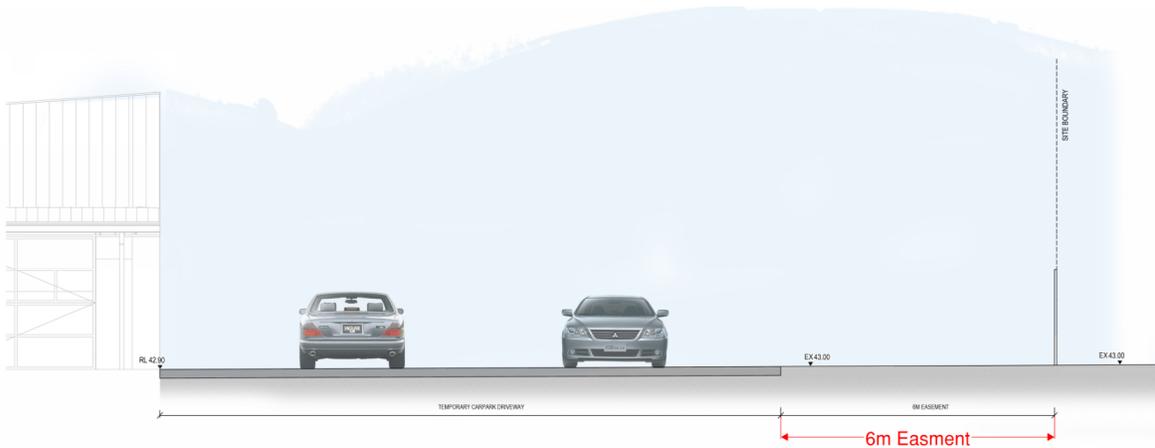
Shared plaza not constructed – temporary carpark driveway/circulation
